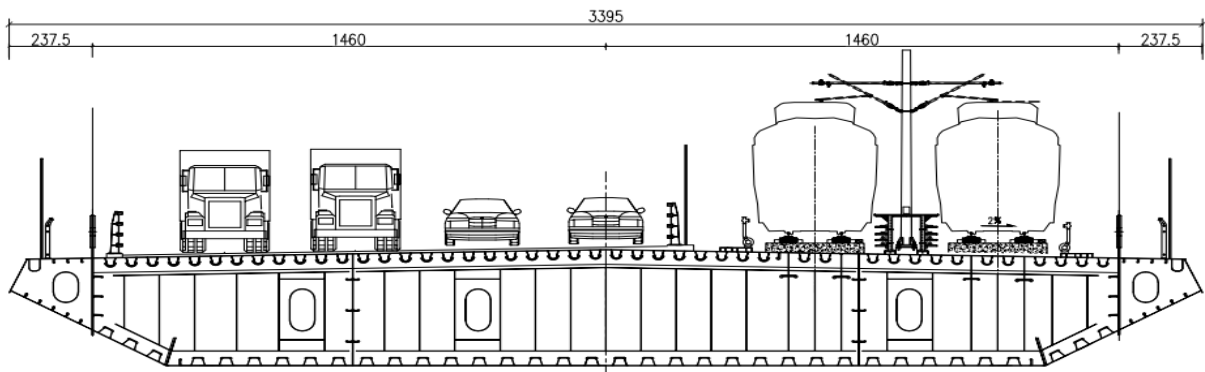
Cross-sectional layout of the main beam (unit: cm).
